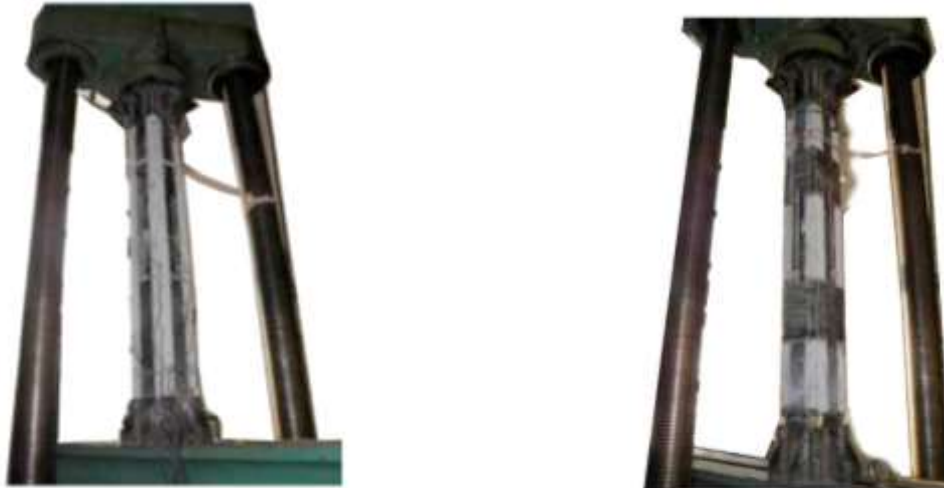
The process of testing a reinforced concrete column reinforced with lamellas (left) and lamellas and clamps (right) (source [5])
